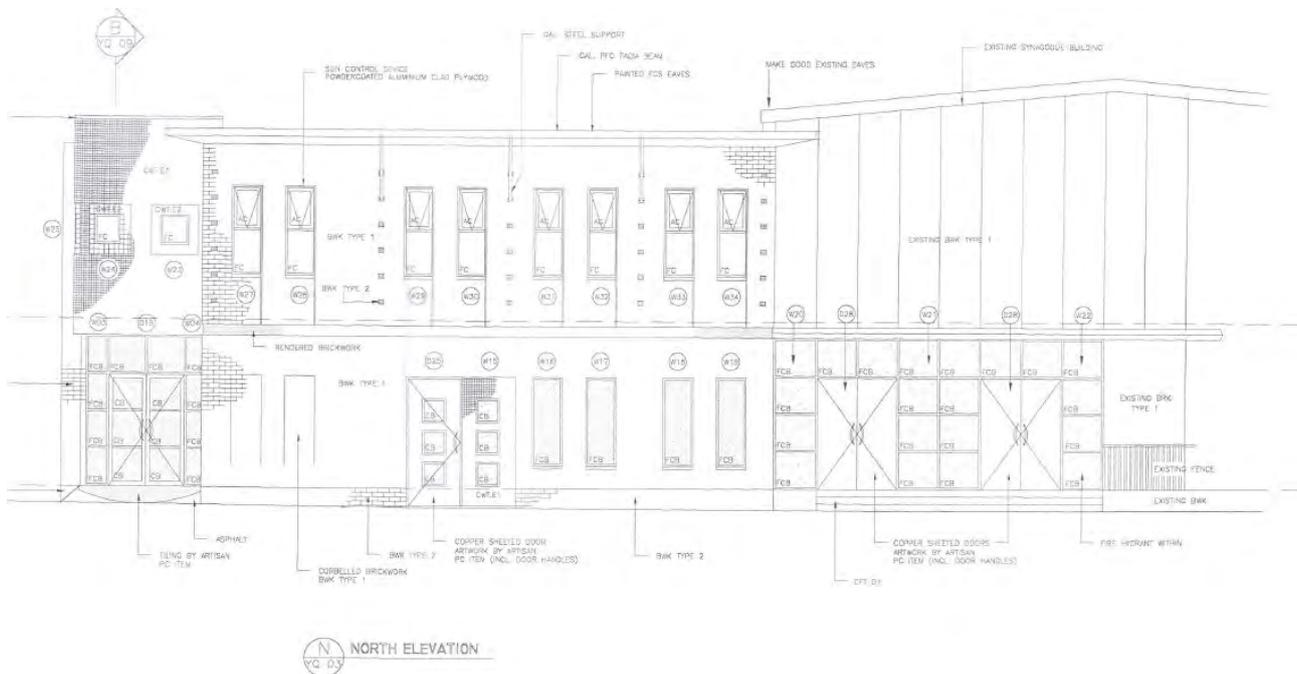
Drawing of northern elevation dated February 1996, Forward Viney Woollan (Source: Council Building File, B0364/1996/P/0-01)
